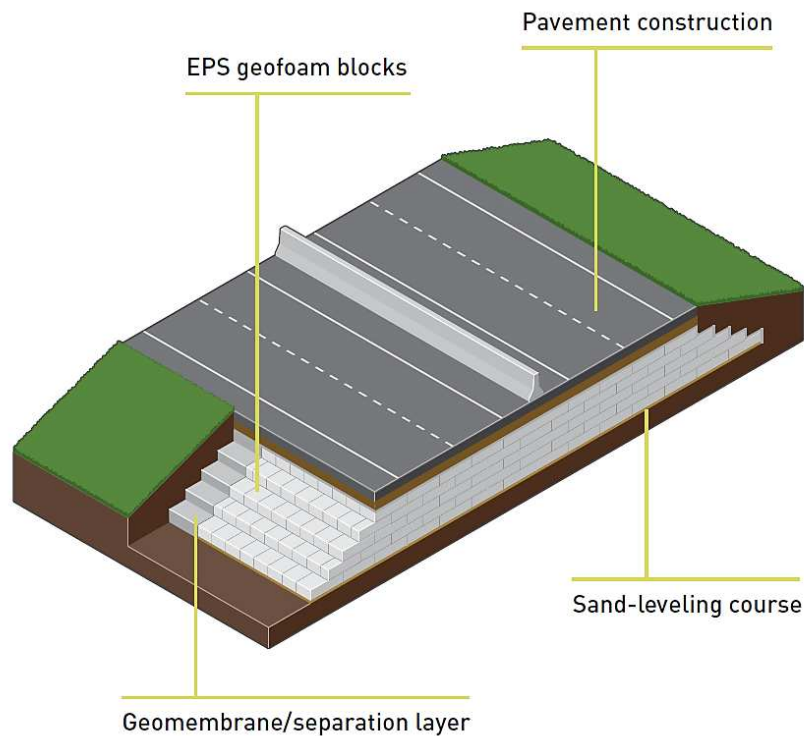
Cross section of embankment and road construction using EPS geofoam (after The EPS Industry Alliance)
